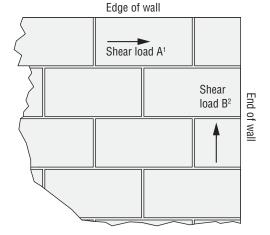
Direction of Shear Load in Relation to Edge and End of Wall
